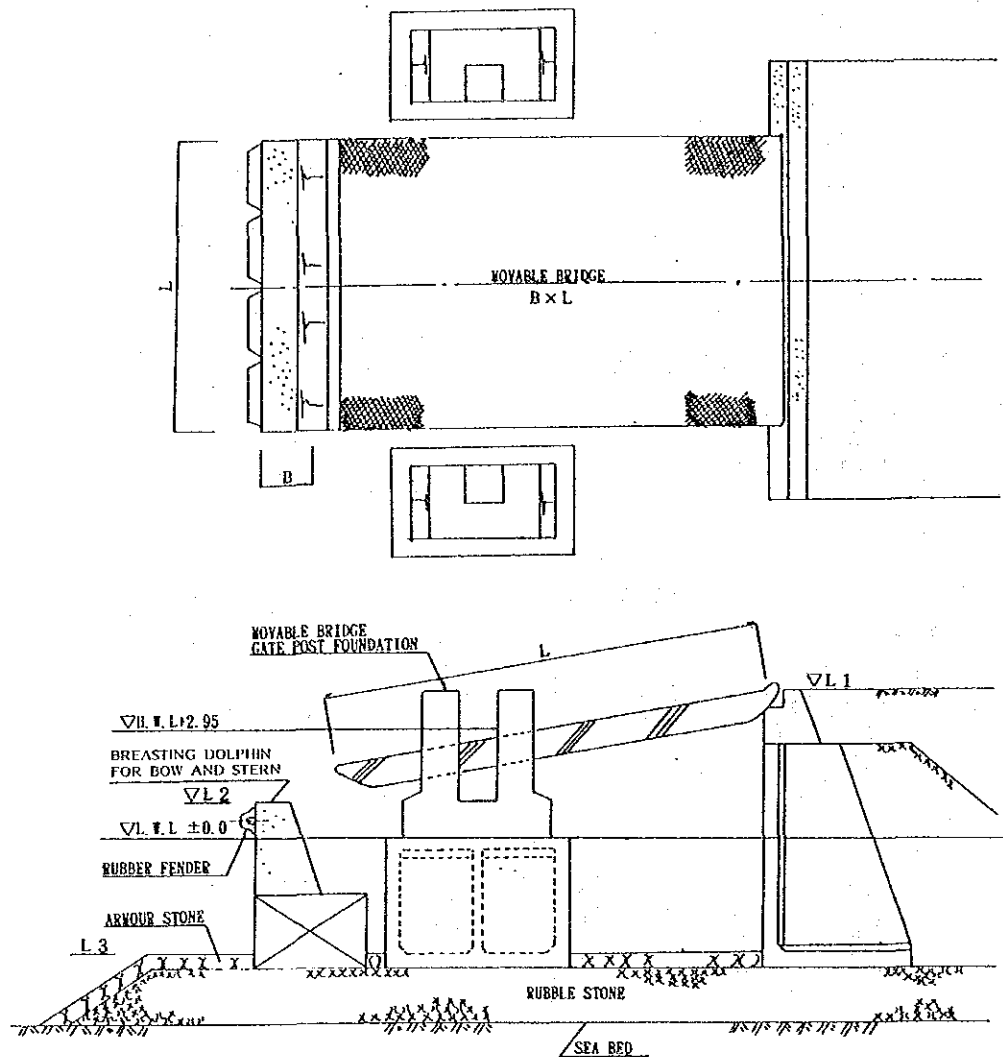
Layout of Mooring Facilities of Terong Ferry Terminal
